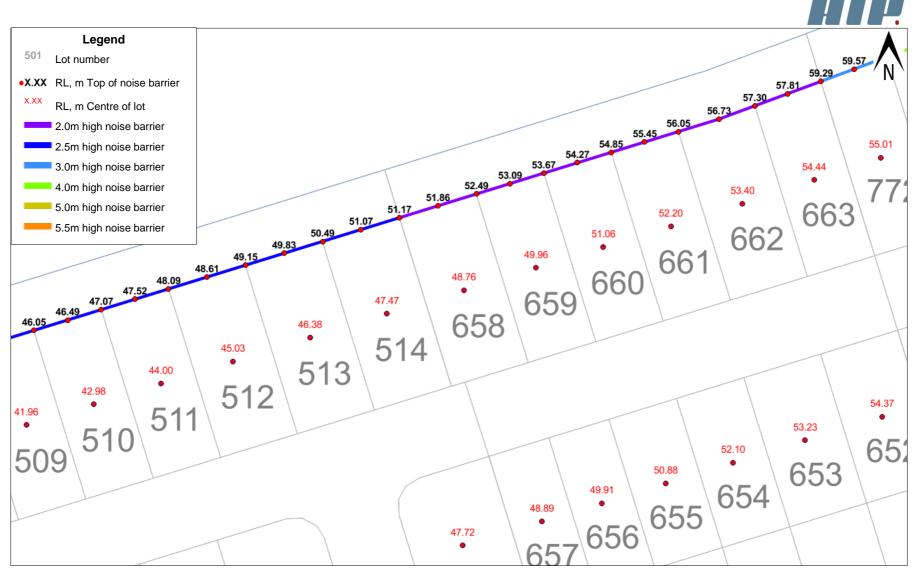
Noise barrier alignment – Scenario 1 – Detail 2
